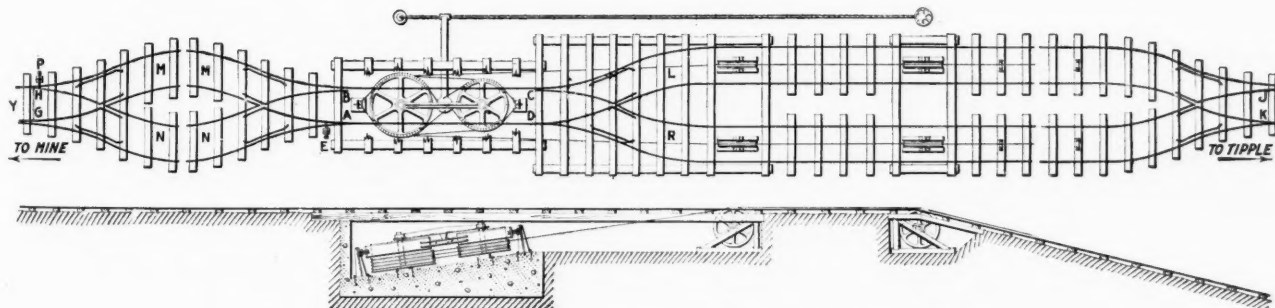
PLAN AND SECTION OF A 4-RAIL INCLINED PLANE
